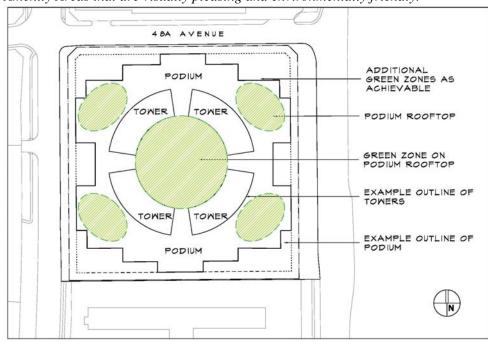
Illustrative roof plan showing how roof top areas should be developed to encourage landscaped Amenity Areas that are visually pleasing and environmentally friendly.
